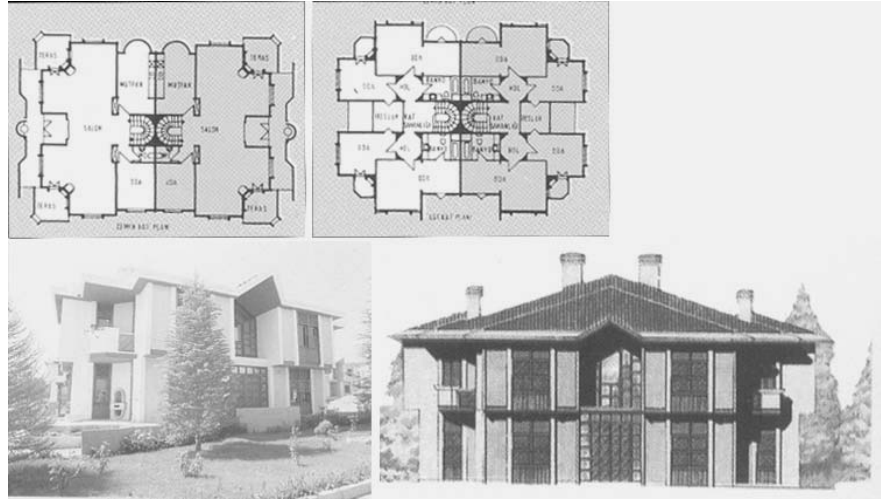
Floor plans, a general view and an elevation of Ladin type of detached villas from the brochure of Bilkent I settlement
